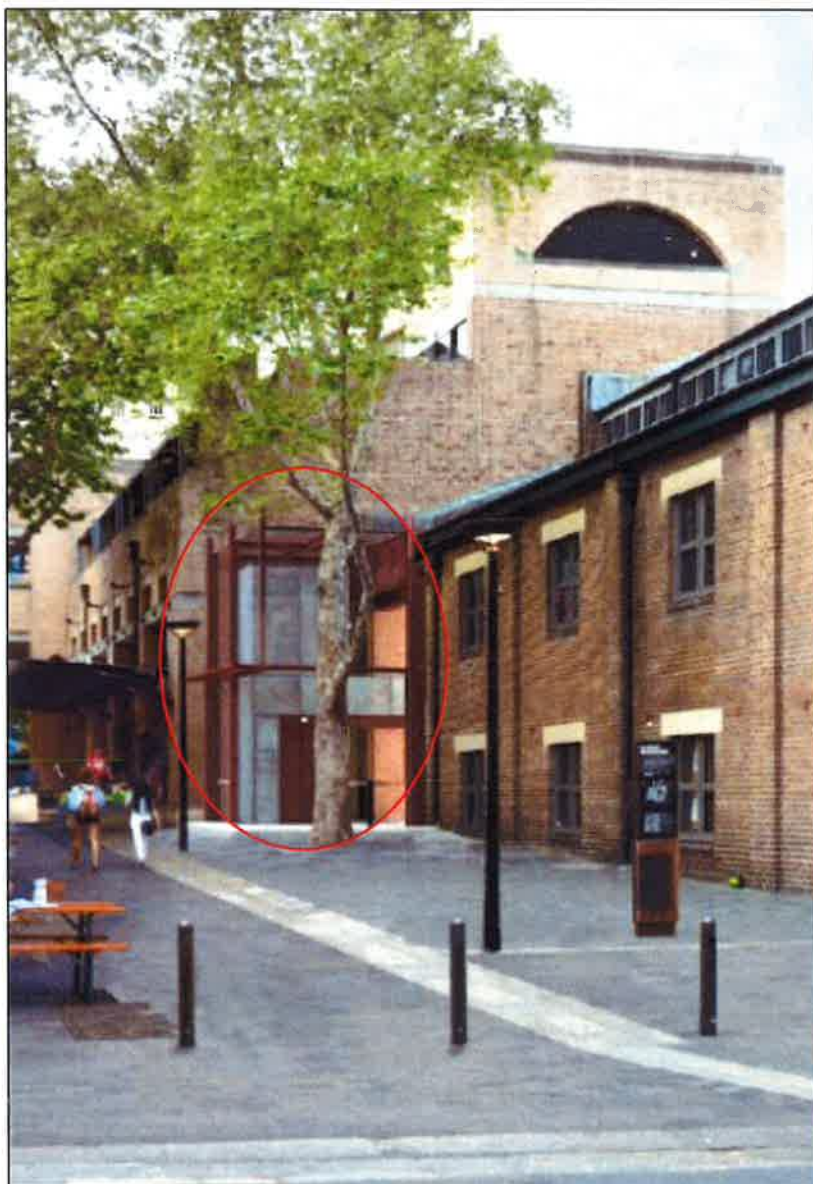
Photomontage of proposed entry structure (Source: Applicant's EIS)
